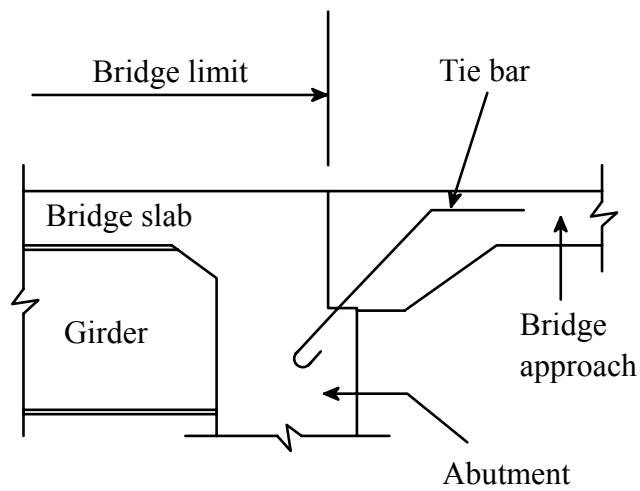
Bridge approach connected to abutment (Ohio DOT 2003)
